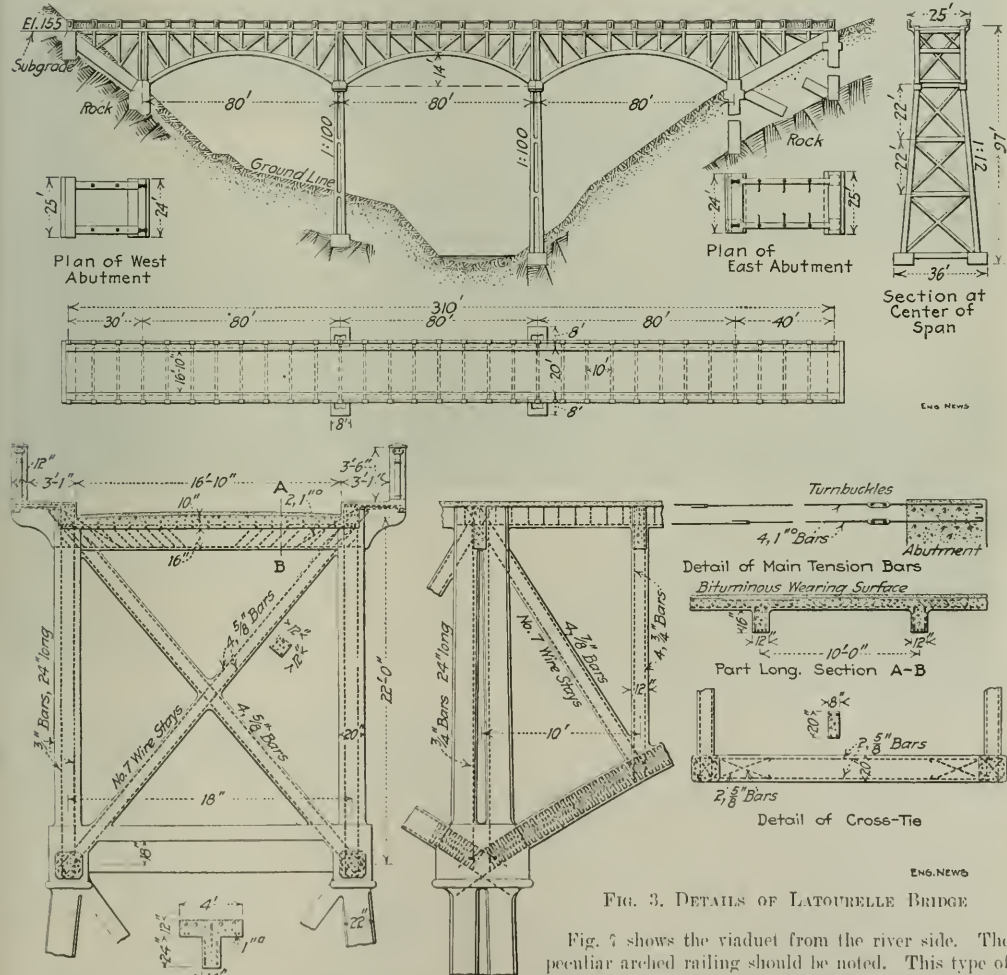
DETAILS OF LATOURELLE BRIDGE
